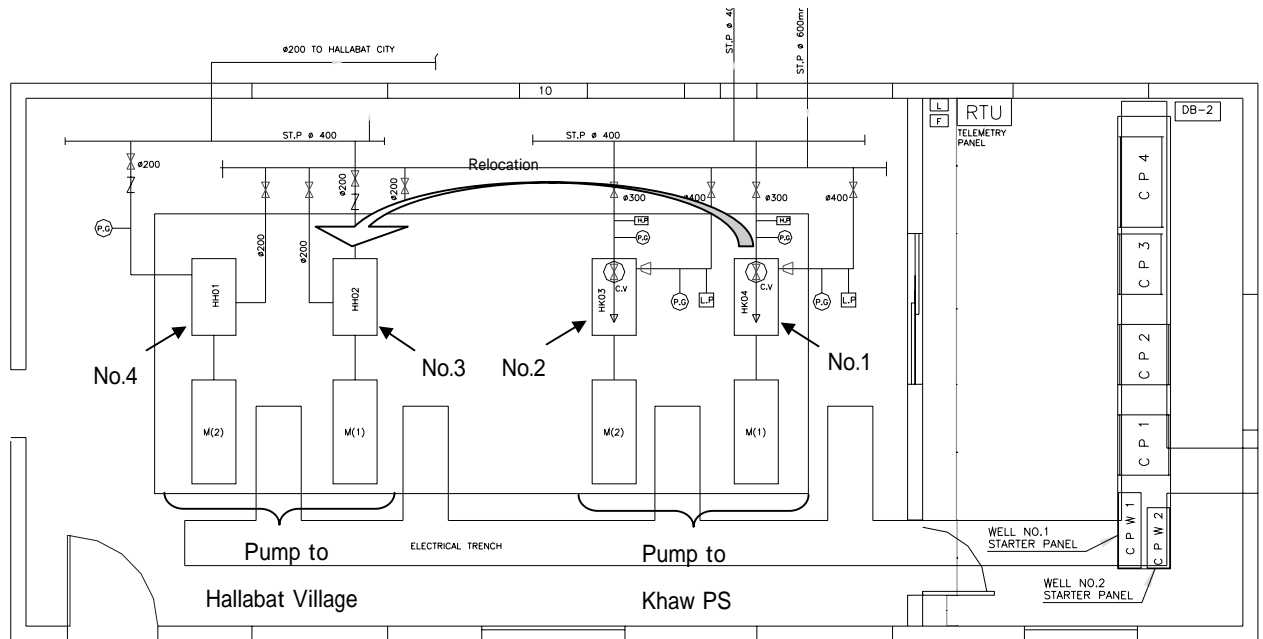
New Layout Plan of Hallabat Pumping Station
